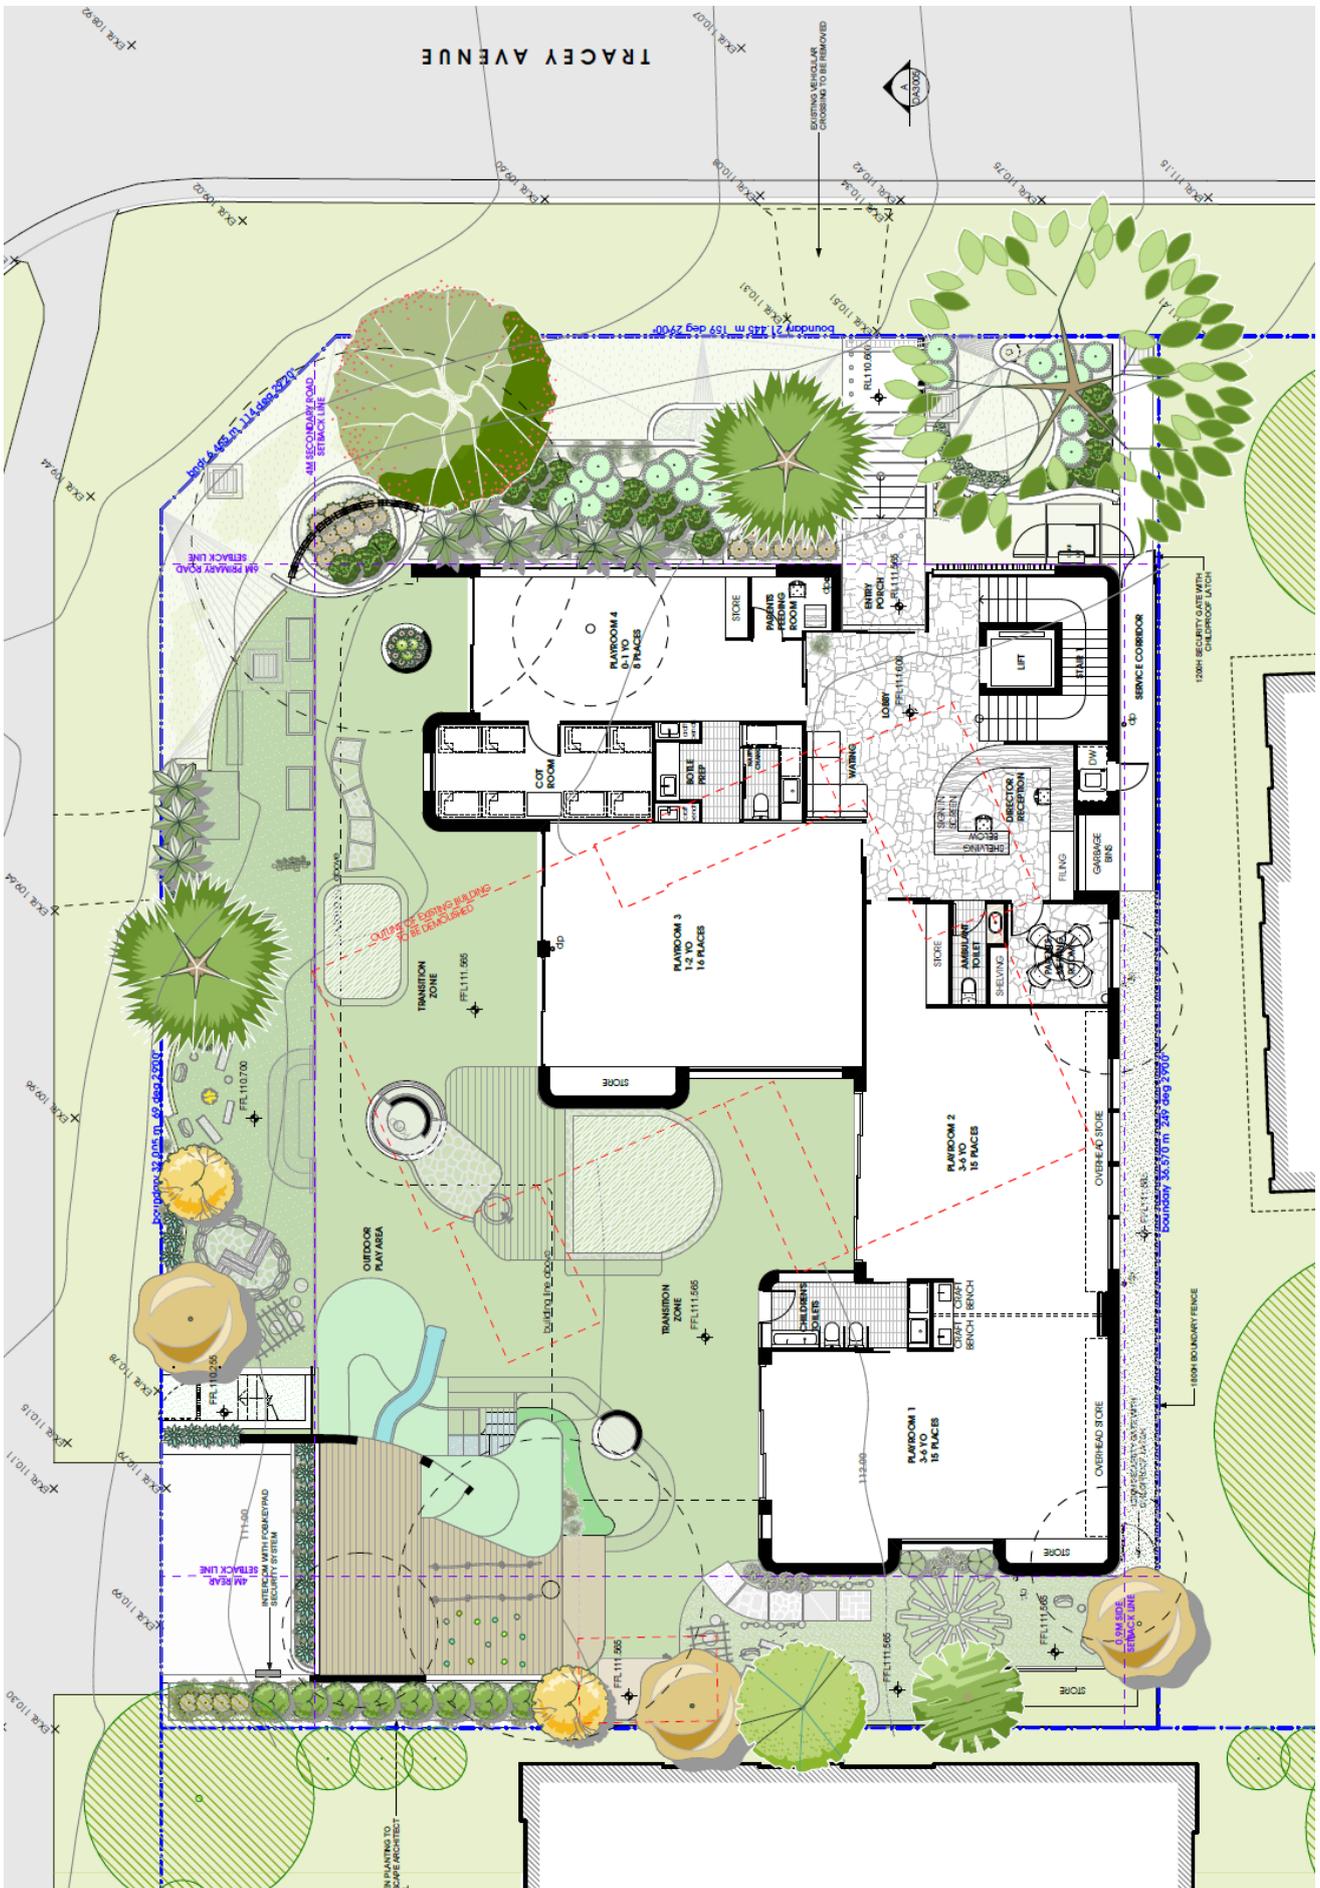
Proposed Childcare Centre (Ground Floor Complete Site – refer to Appendix A)
